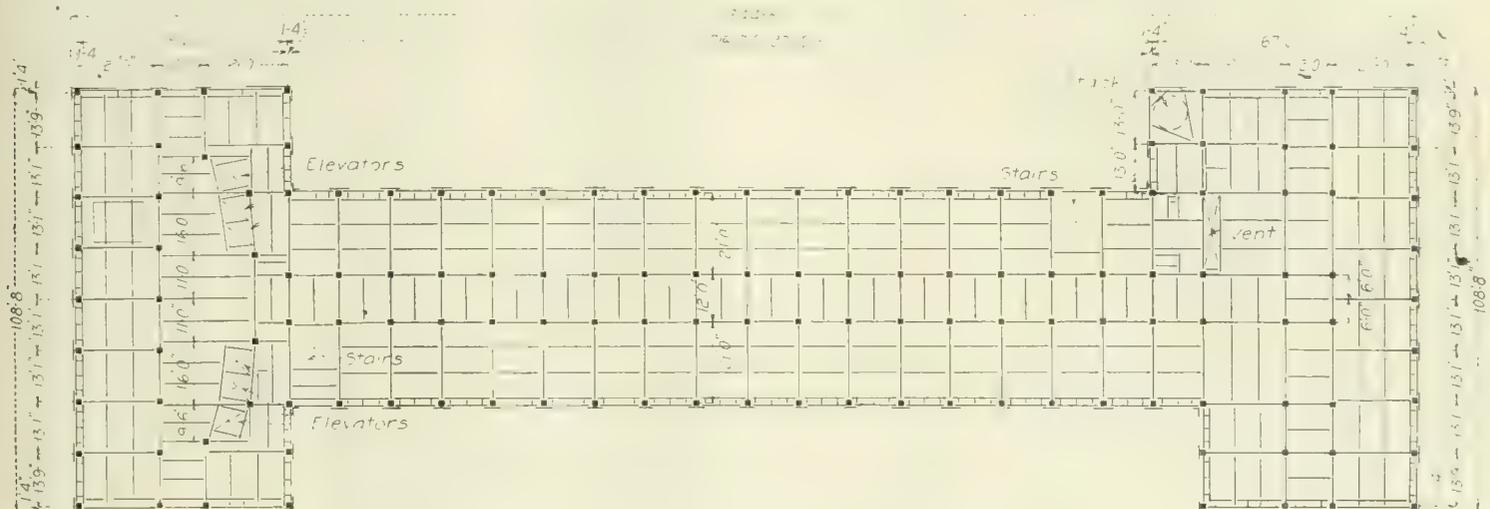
Framing Plan of Typical Office Floor of Michigan Central Office Building at Detroit, Mich.
